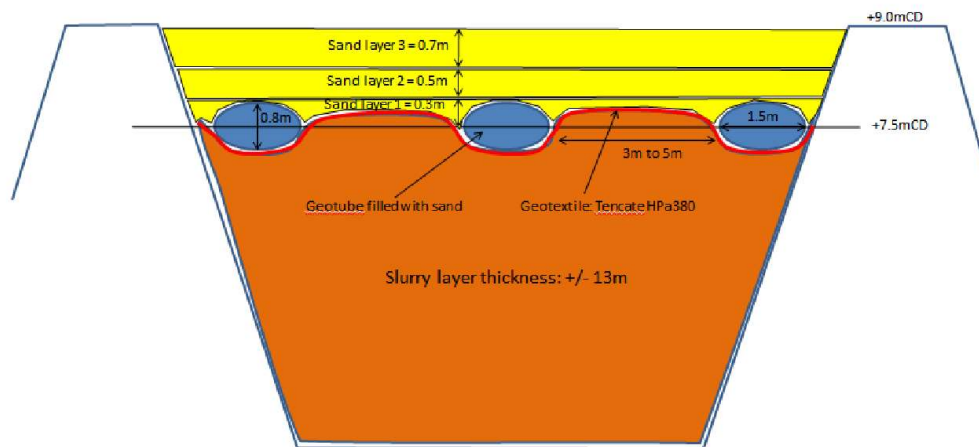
Placement of geotubes caused deformation and tension in the geotextiles
